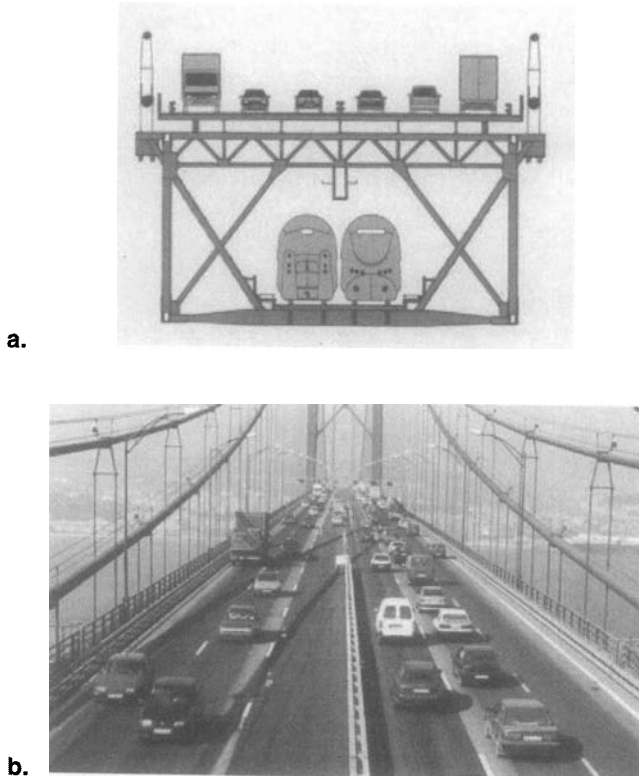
Deck widening at 25th of April Bridge (Bridge over the Tagus) in Lisbon, Portugal: a., widened cross section; b., view of the deck after 6 lanes were installed, 1998
